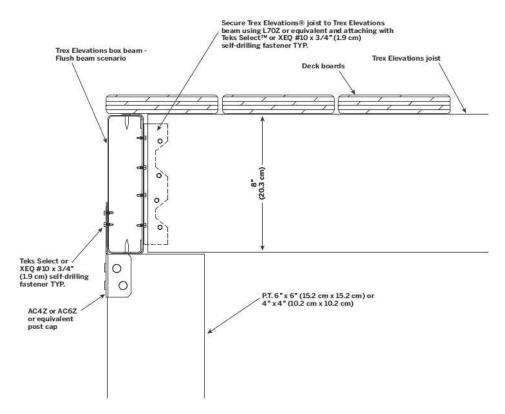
1-5/8 Joist to Box Beam Construction Detail – Flush Beam Scenario
